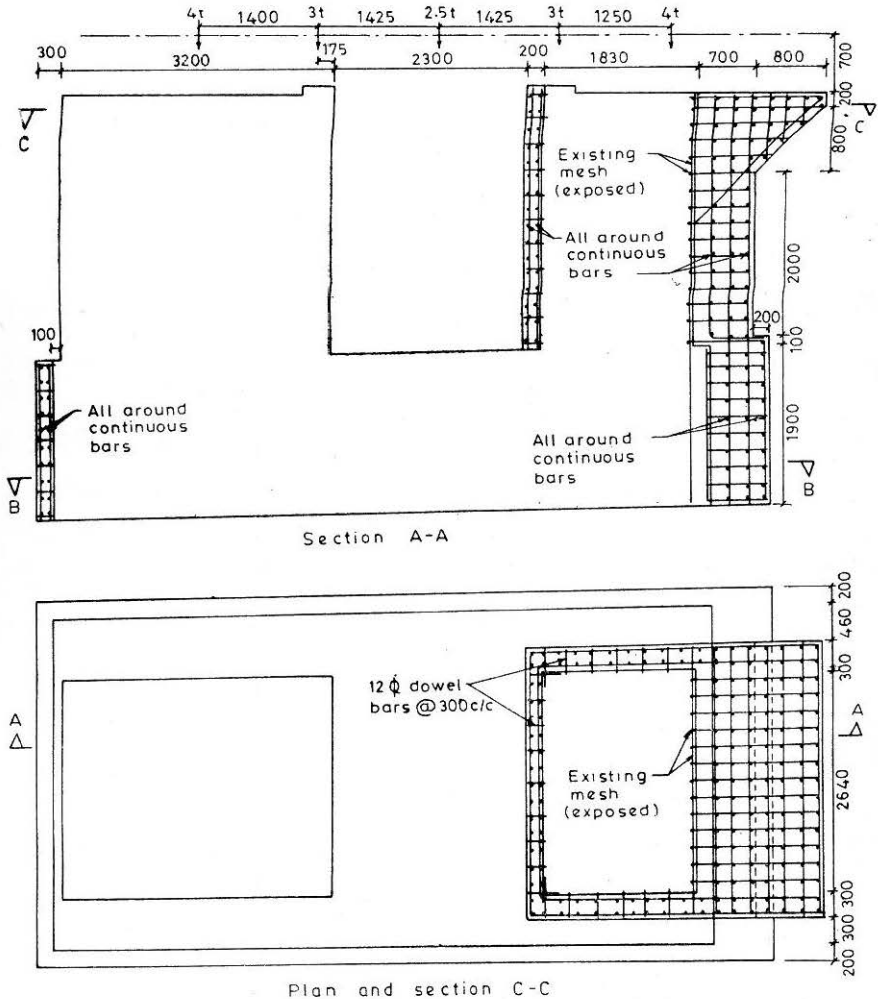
(a) Additional Concrete and Reinforcement to Strengthen Existing Foundation.
